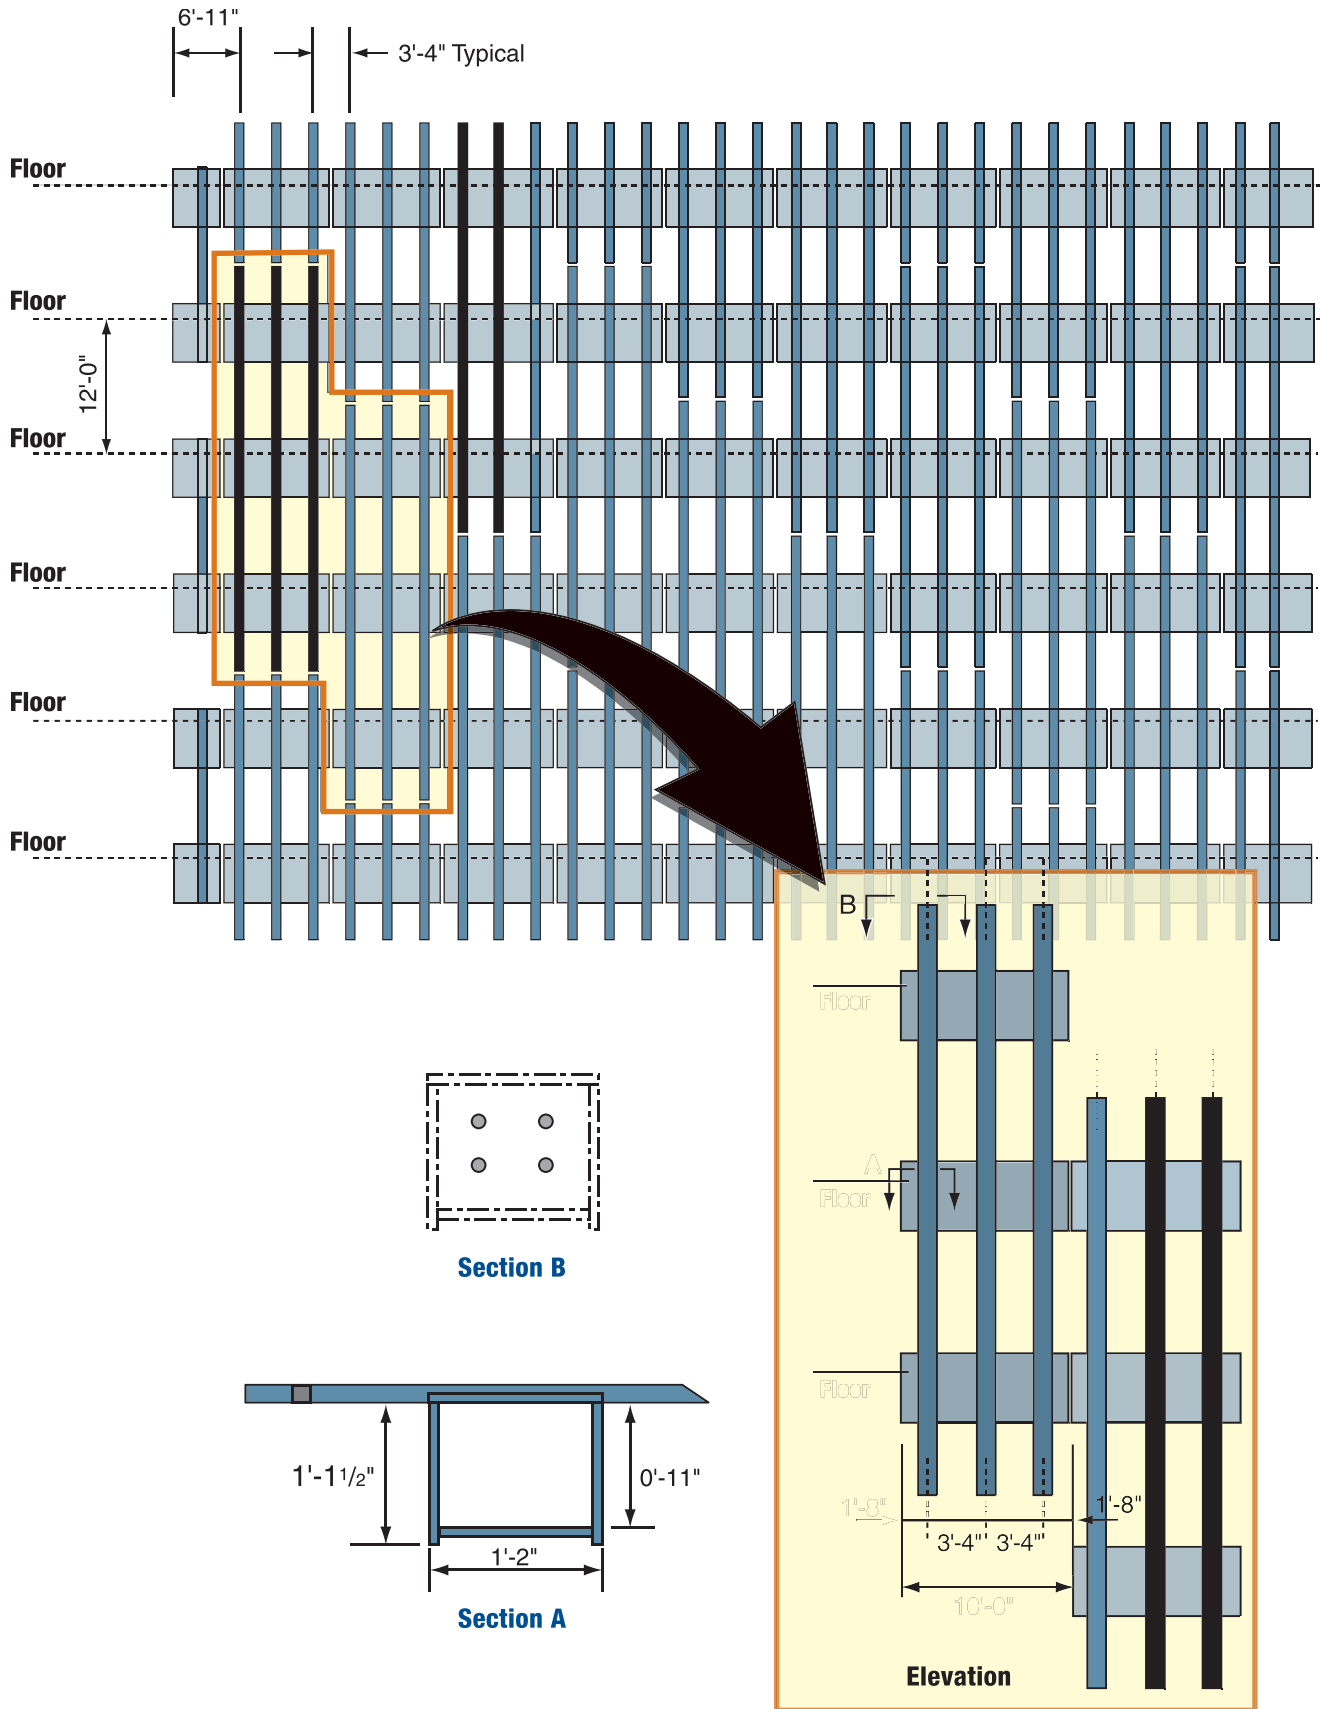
Partial elevation of exterior bearing-wall frame showing exterior wall module construction.
